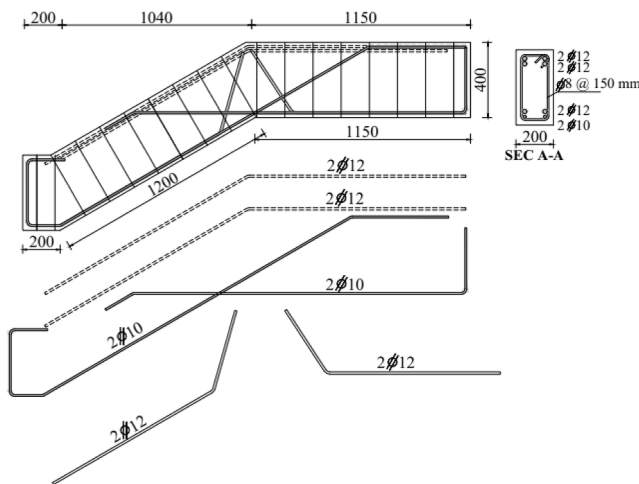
Dimension and reinforcement details of the reference beam (B0).
